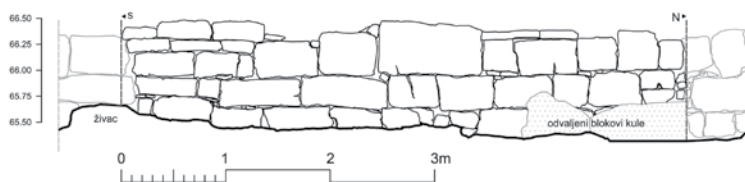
Interior face of the western tower wall. Made by Andrea Devlahović (2019). (Odvajljeni blokovi kule = dislocated tower blocks). See also Kirigin and Popović 1988, 181, Figure 10.1 below.
